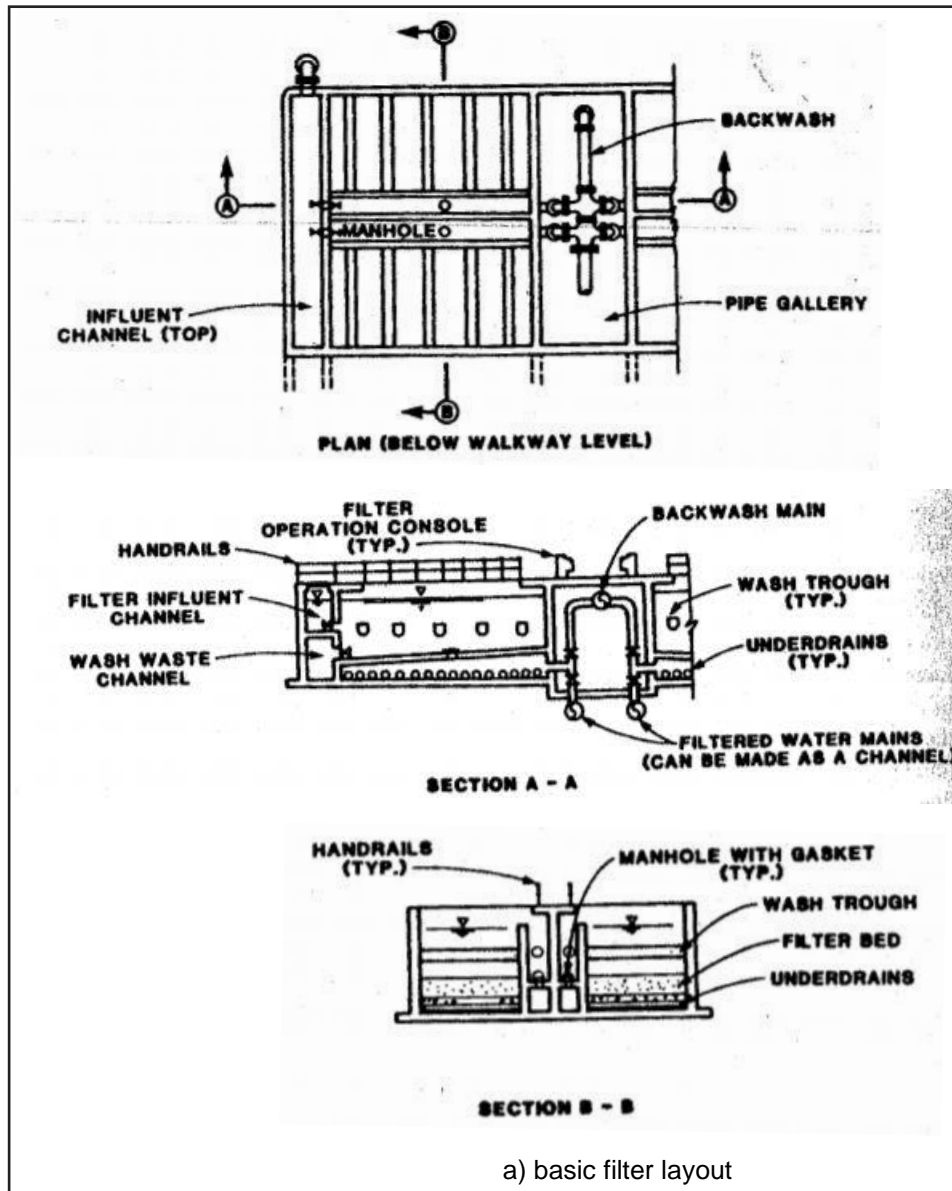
Typical Filter Layout Configurations (Kawamura, 2000)
